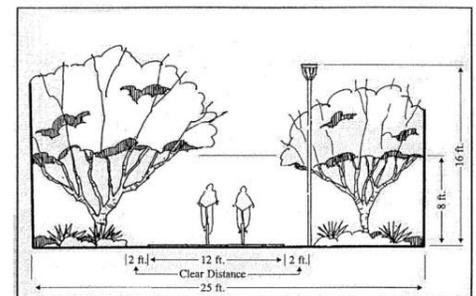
Recommended Path/Trail Section, Provided by the Tempe Multi-Use Path System Detailed Plan.
